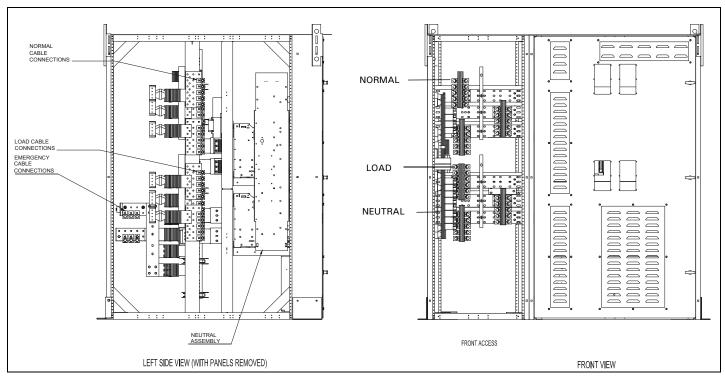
Terminal Connections for a Typical Drawout Transfer Switch (4000A Shown).
